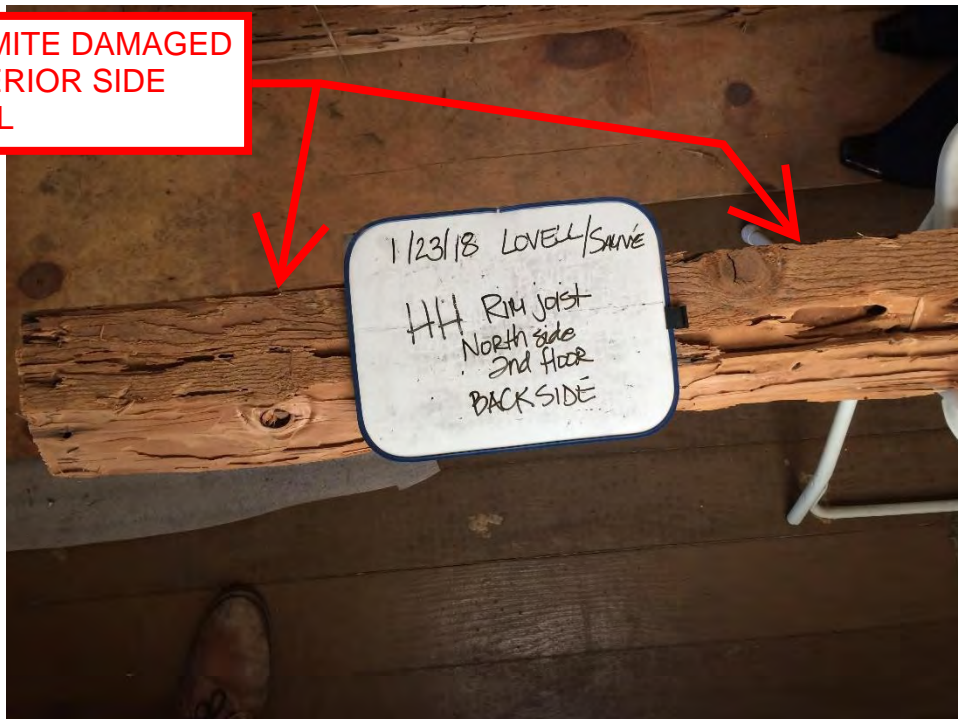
NORTH ELEVATION – DAMAGED RIM JOIST
